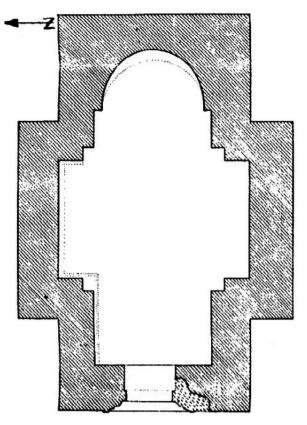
C. CHURCH WITH CROSS PLAN: (C) ST. MARY.
